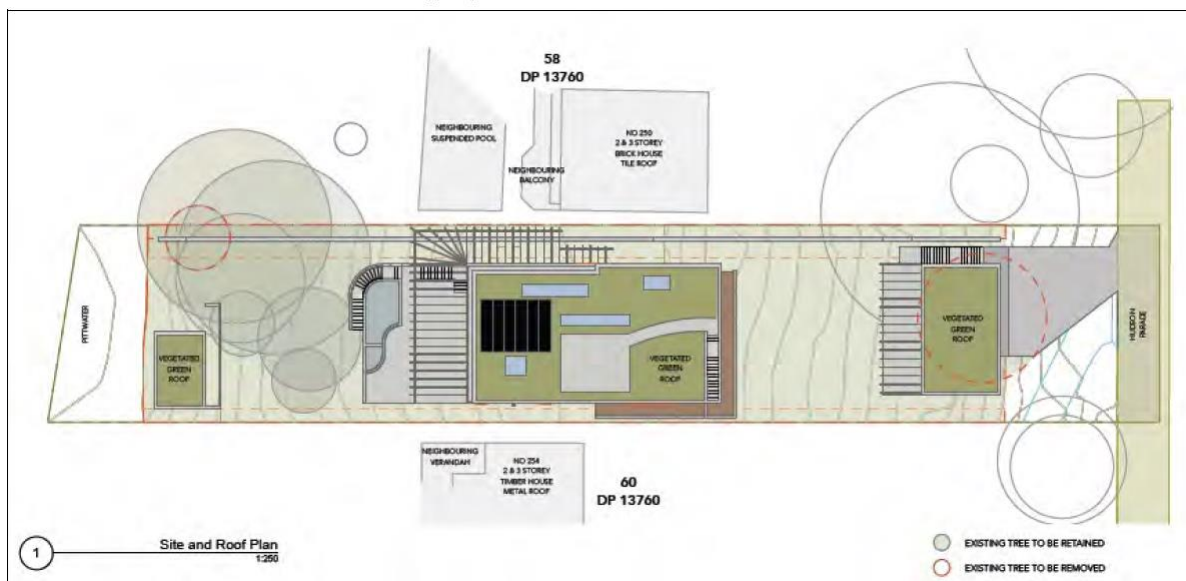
Proposed Plan Source: Anne Robson Architecture April 2023
